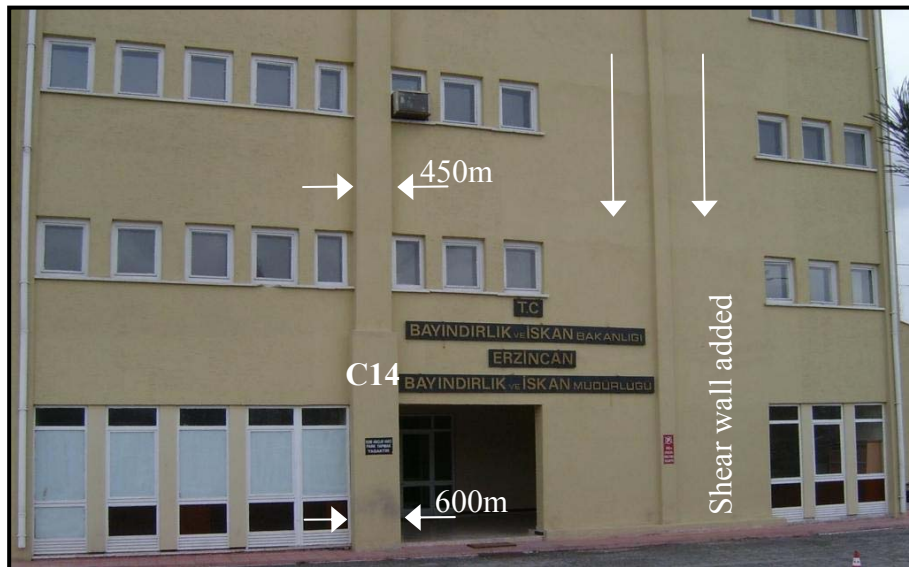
The front view of the Erzincan building after the retrofit. Shear walls added at the exterior frame. Jacketed column-C14 at the ground and upper floors; the initial width of the column was 300 mm.
